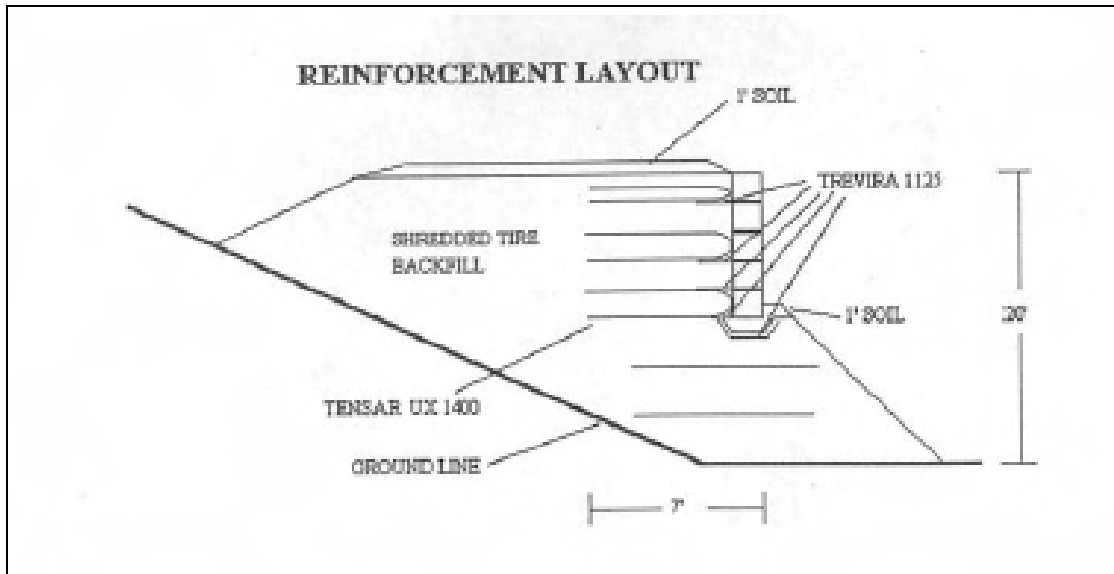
Glenwood Canyon Retaining Wall Detailed View of Layer
